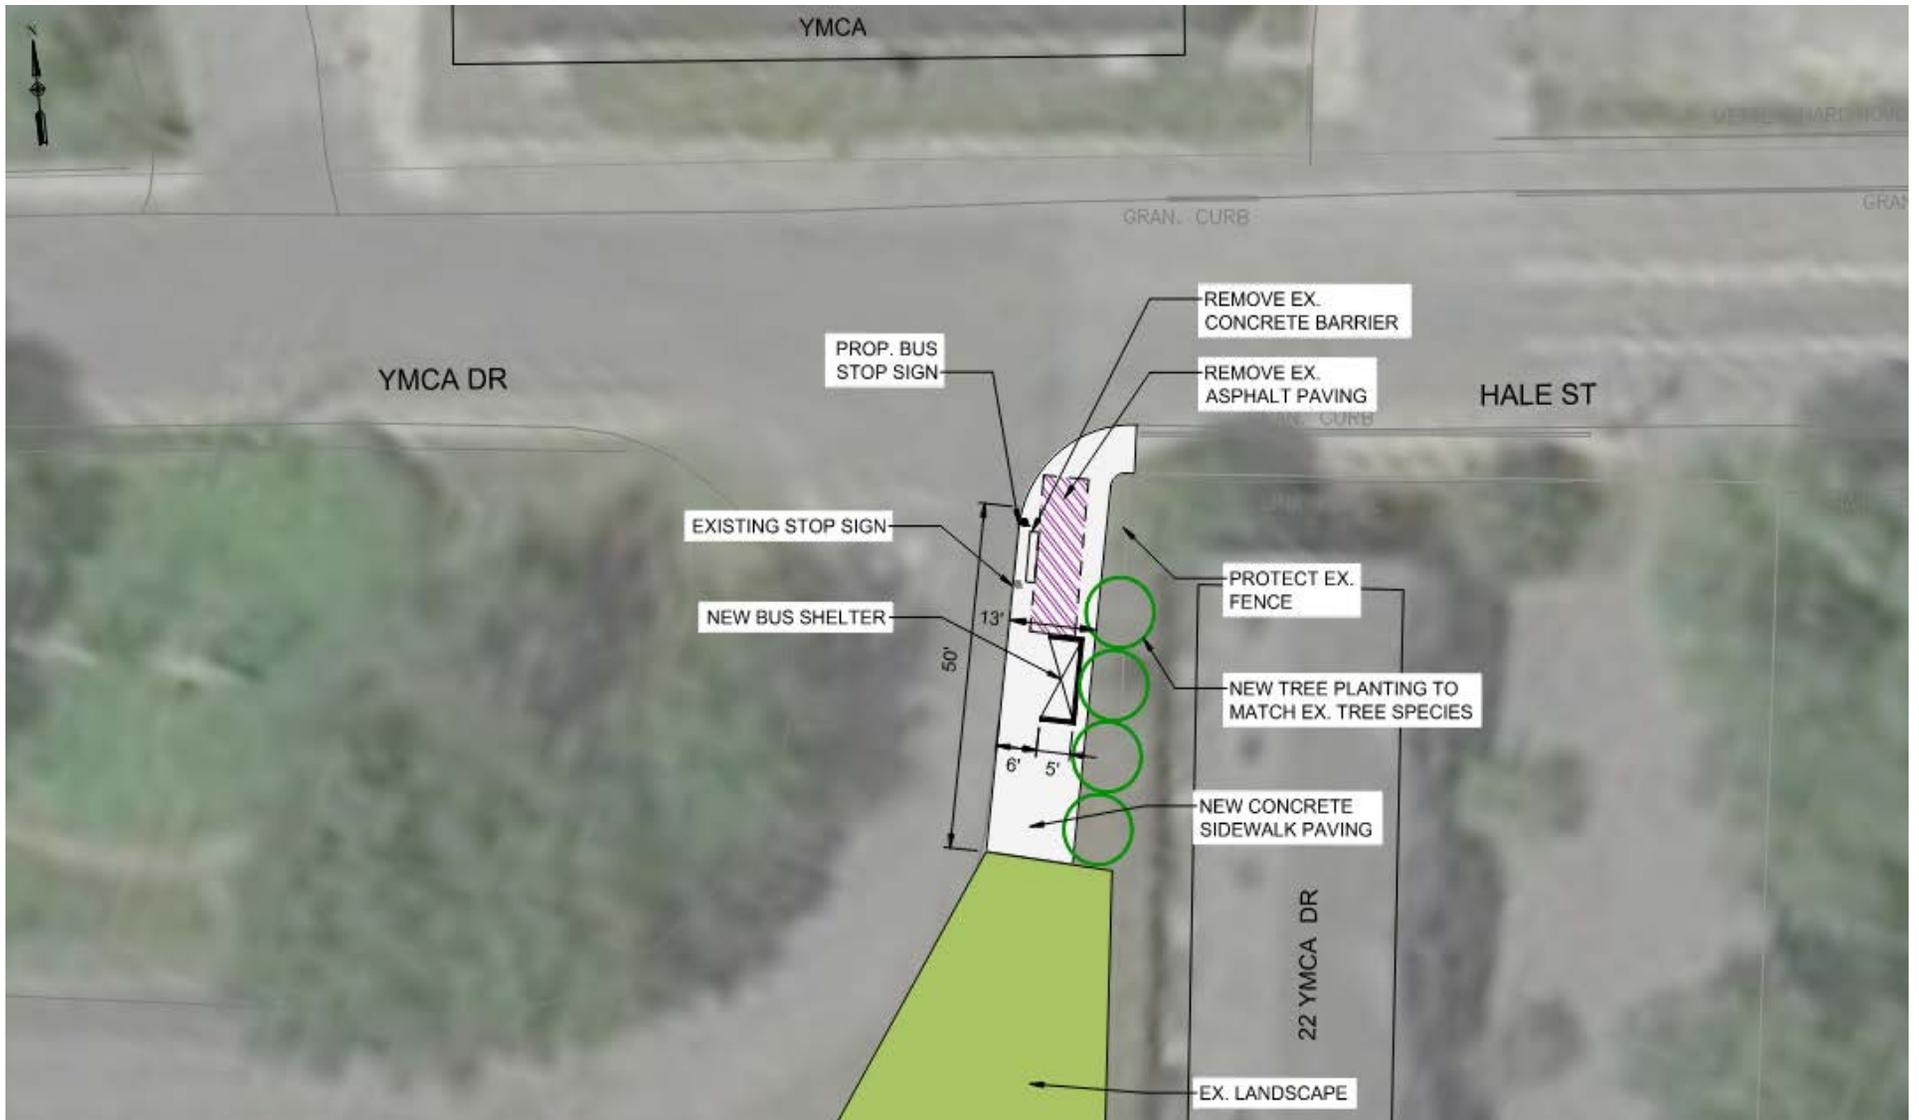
Bus Stop Improvements Concept Plan for Hale Street at YMCA Drive
